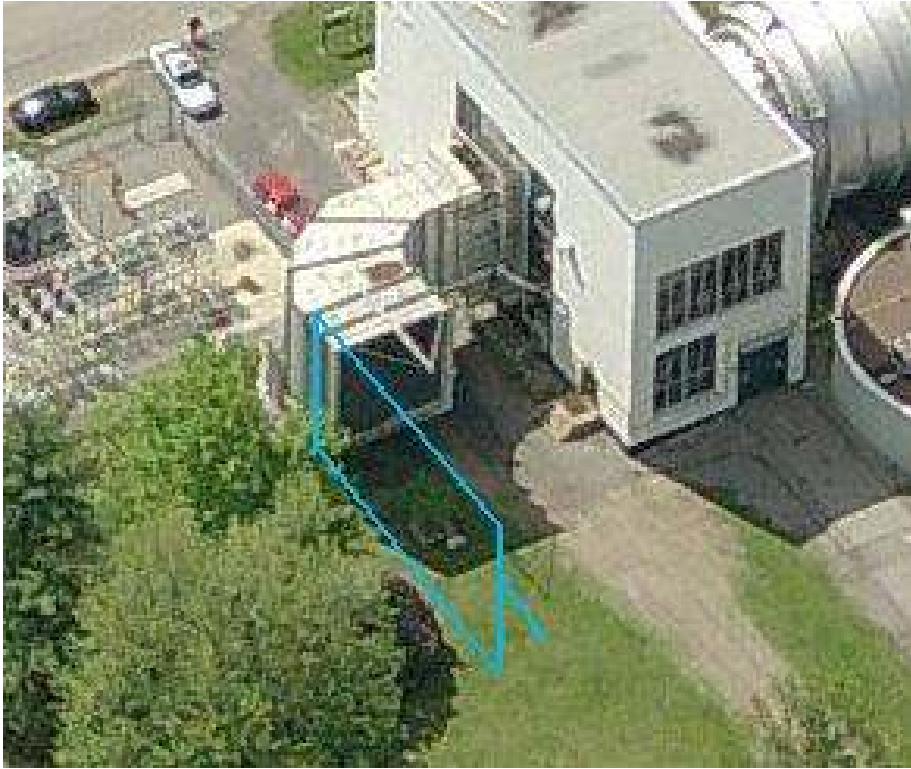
M46 Wind Tunnel Exhaust Barrier Wall – Concept View 1.
